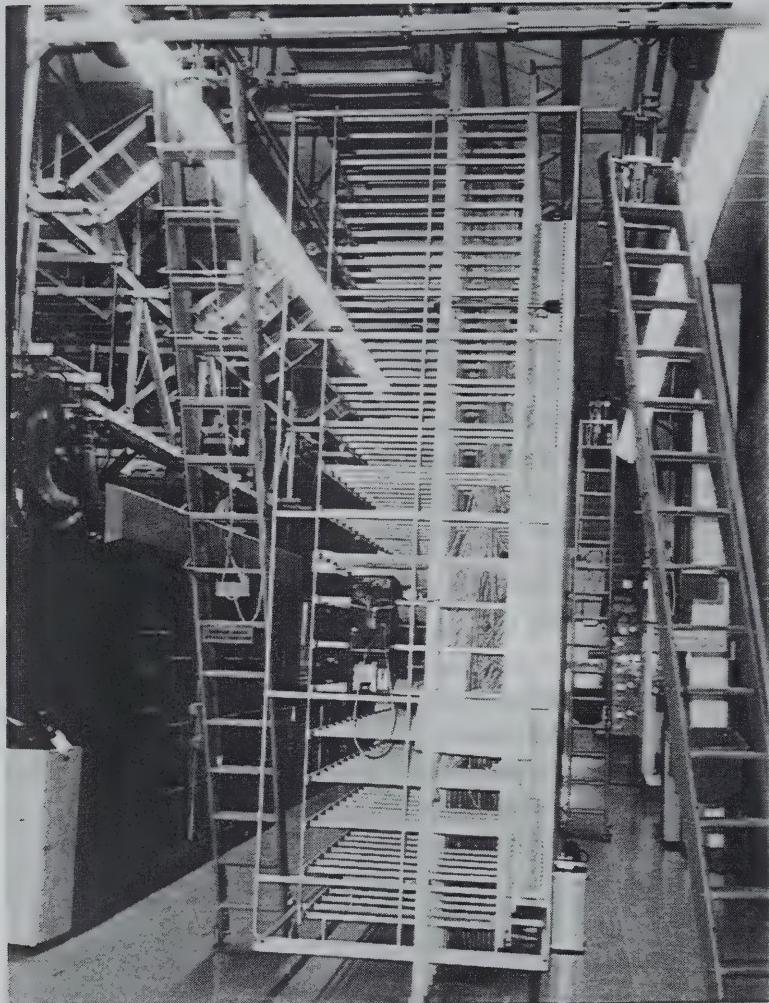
Main distribution frame at a power system facility. Large rack deflections have been observed due to the flexible base detail.
